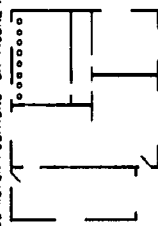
Precast Concrete House, Horizontal Traverse along Hallway 3 Inches above Floor; 42.5-Inch Source Radius
